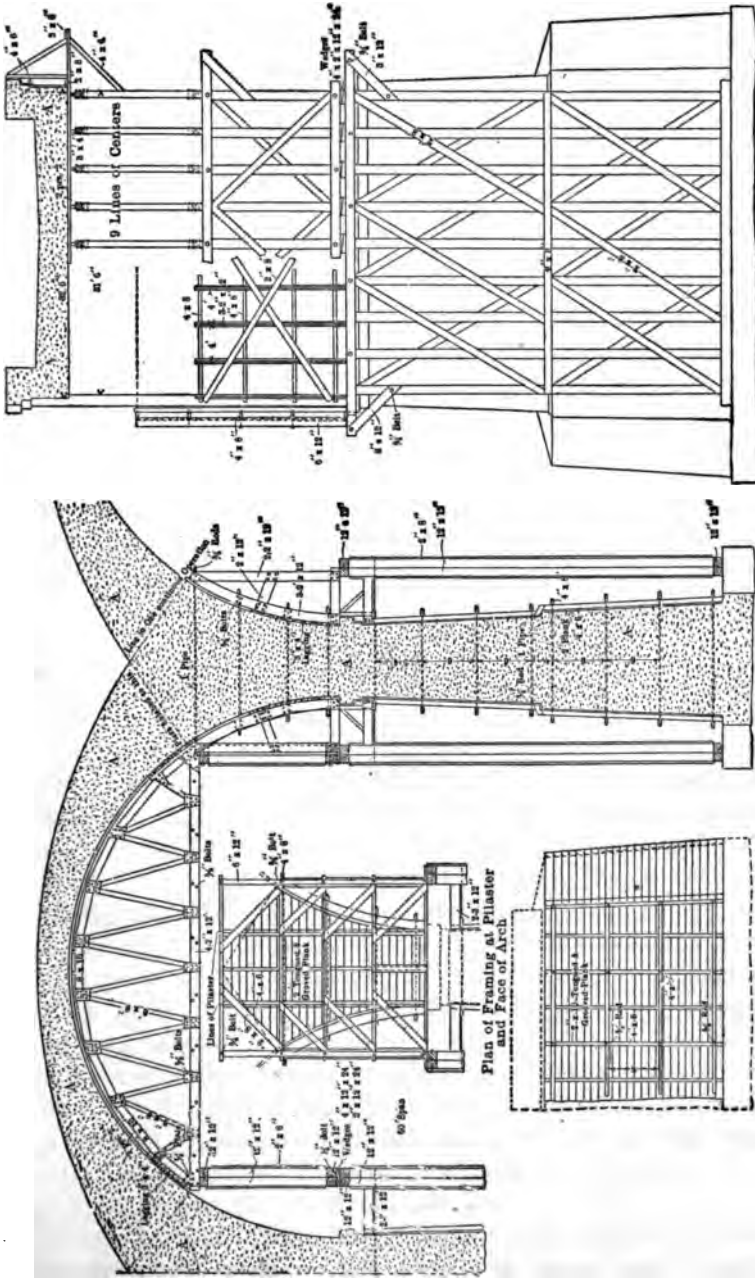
Transverse Section, Pennypack Creek Bridge.
